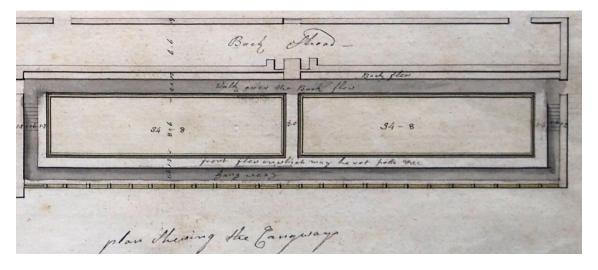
DETAIL OF THE 1758 STOVE PLAN SHOWING THE LAYOUT OF WALKWAYS AND GANGWAYS OVER FLUES, THE TAN BEDS AND PLANT SHELVES (BURTON CONSTABLE HALL, 1758)
